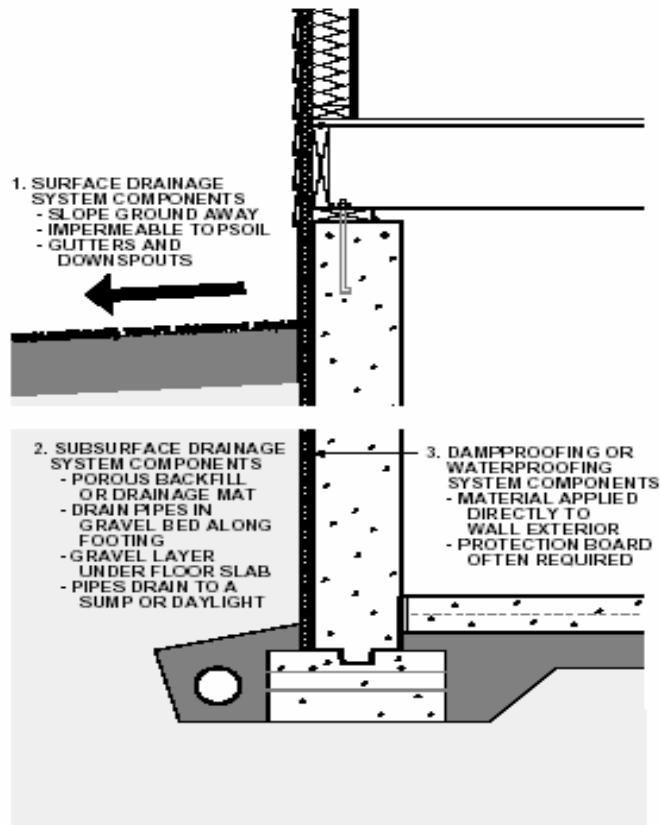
Components of Basement Drainage and waterproofing Systems
